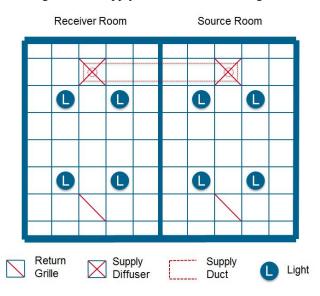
Reflected ceiling plan of the final ceiling system tested showing locations of the air distribution and lighting devices.
